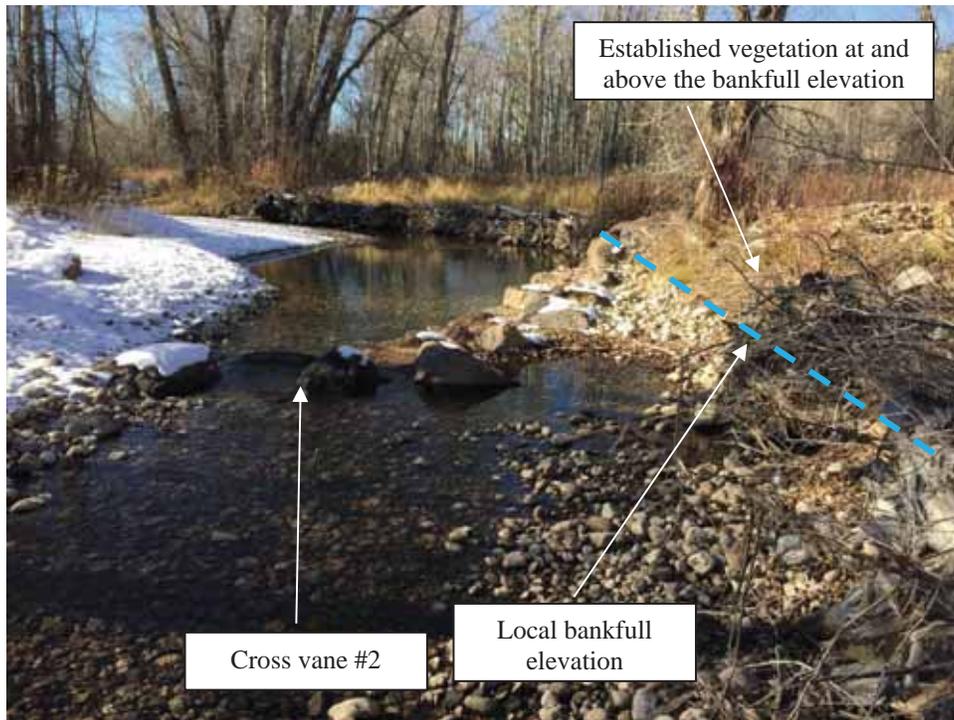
Photograph looking downstream at cross vane 2 (Station 900 ft), Badger Creek N3000W project reach.
